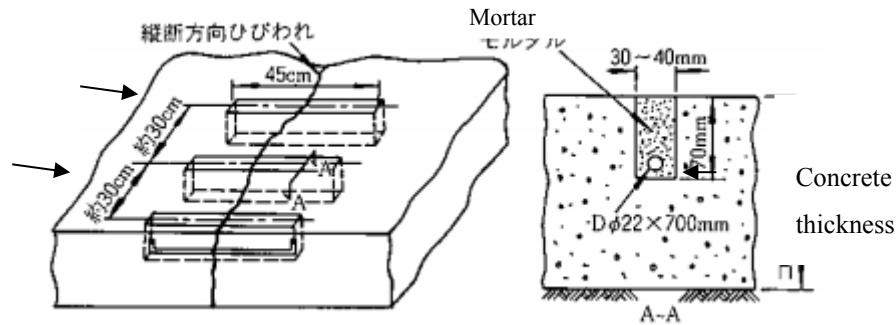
Example of reinforcing vertical sectional cracks
